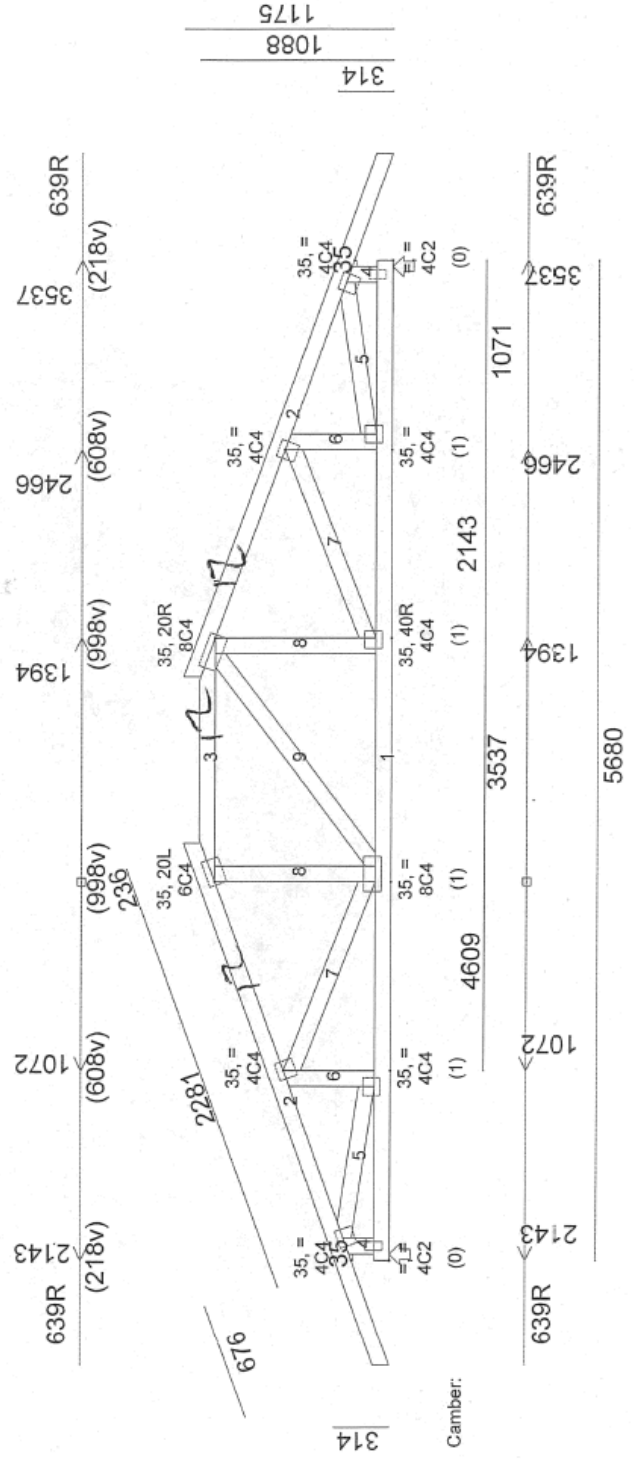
Test Cell 1 – Roof-framing Data: Truss H1 (not to scale)
